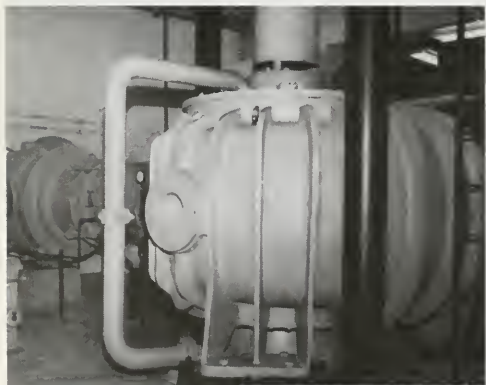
Vertical Centrifugal Pump Installation—Las Perillas
